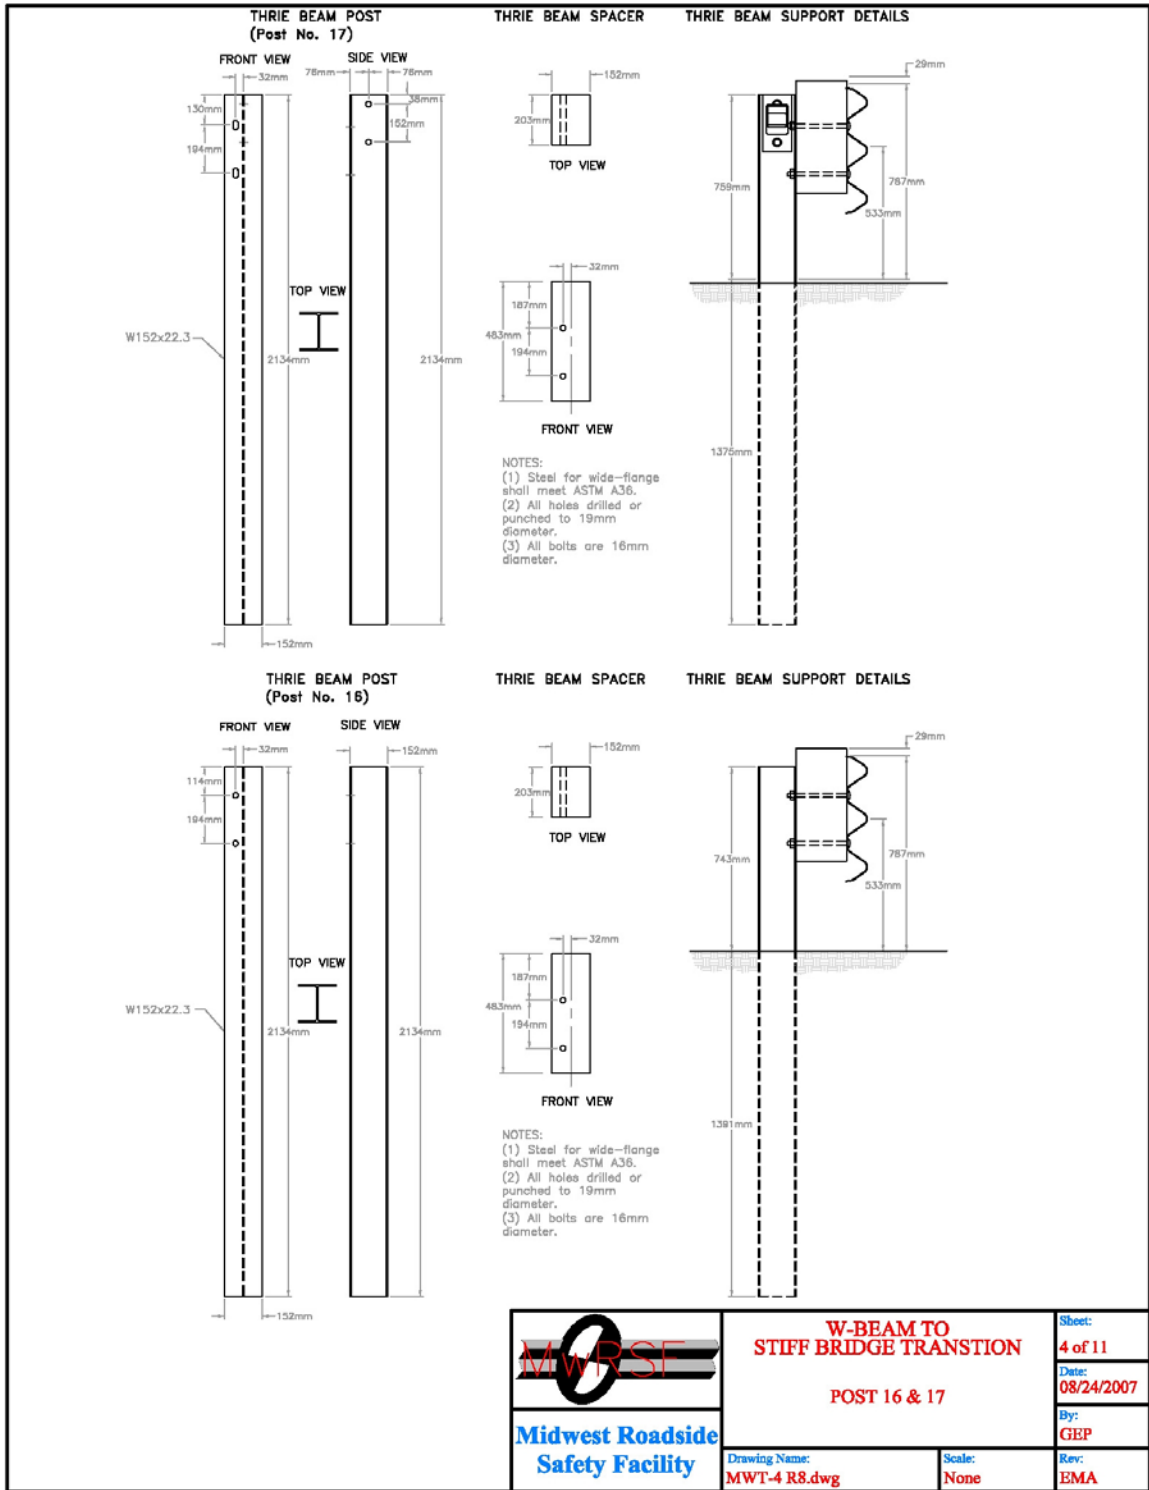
Post Nos. 16 and 17 Details (Design No. 2)
